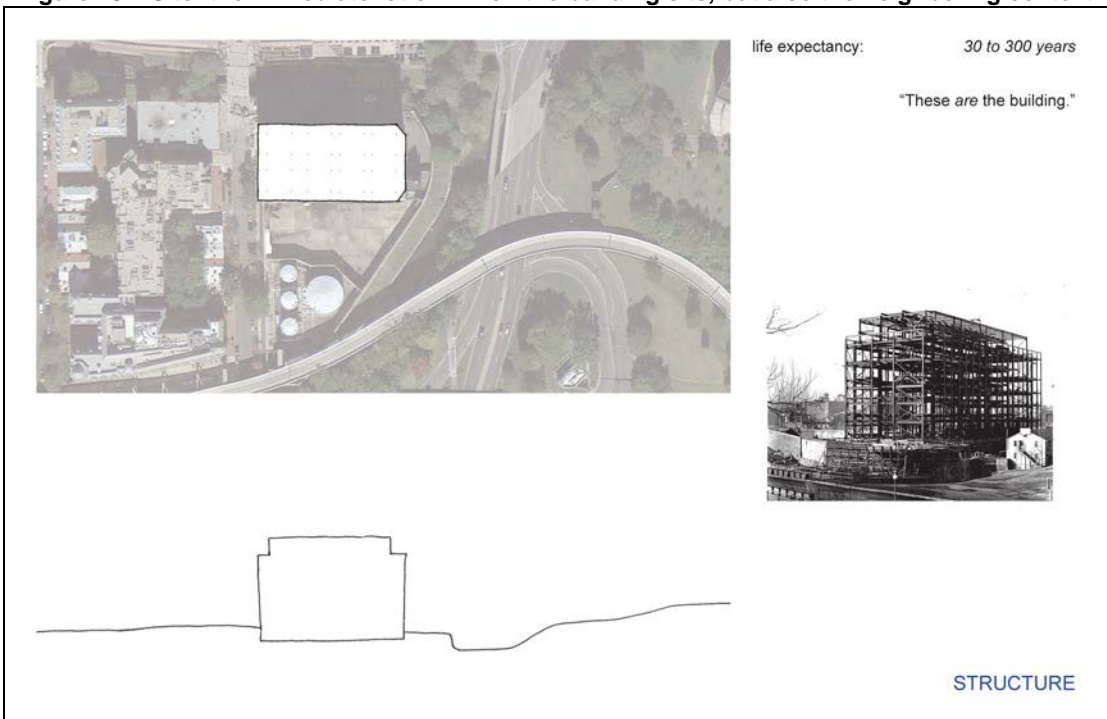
Structure: the steel skeleton of the West Heating Plant
